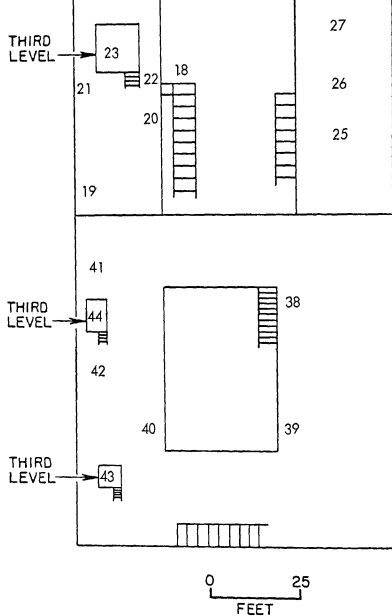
Plan View of Upper Level of Building 7, and Location of Survey Points Listed in Table 2 (see also Fig. 4).
